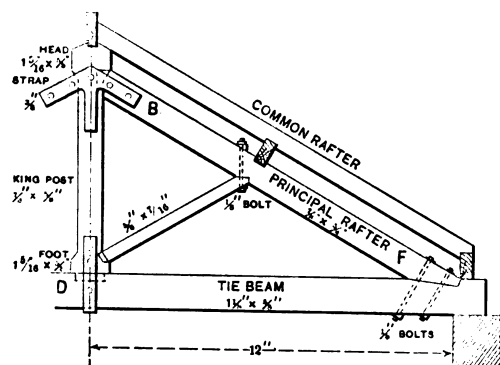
King Post Truss.—Scale, 3-16 Inch to the Inch.
